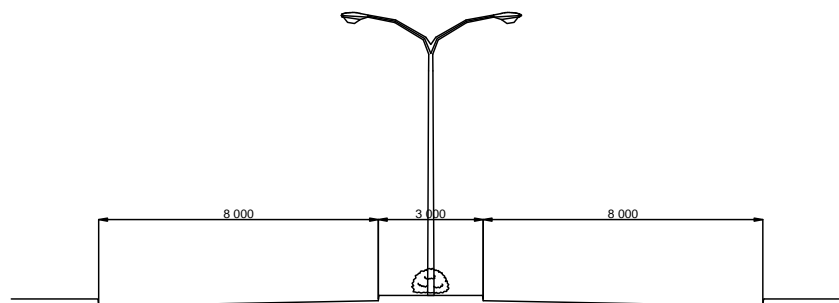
(3) Existing Cross Section at Cuamba Town
